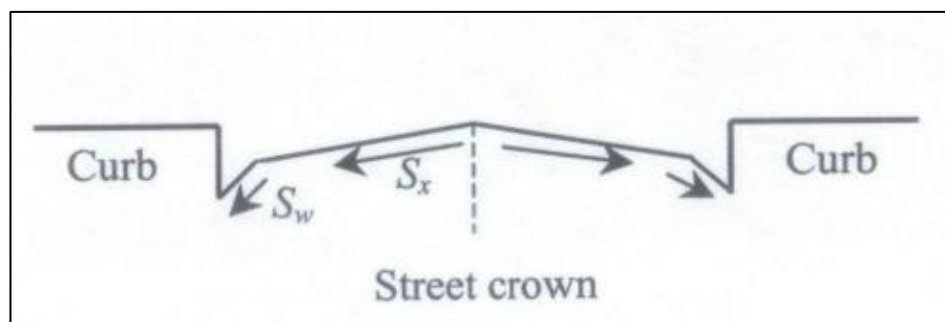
Cross-section of the road (Mustaffa, 2003).
